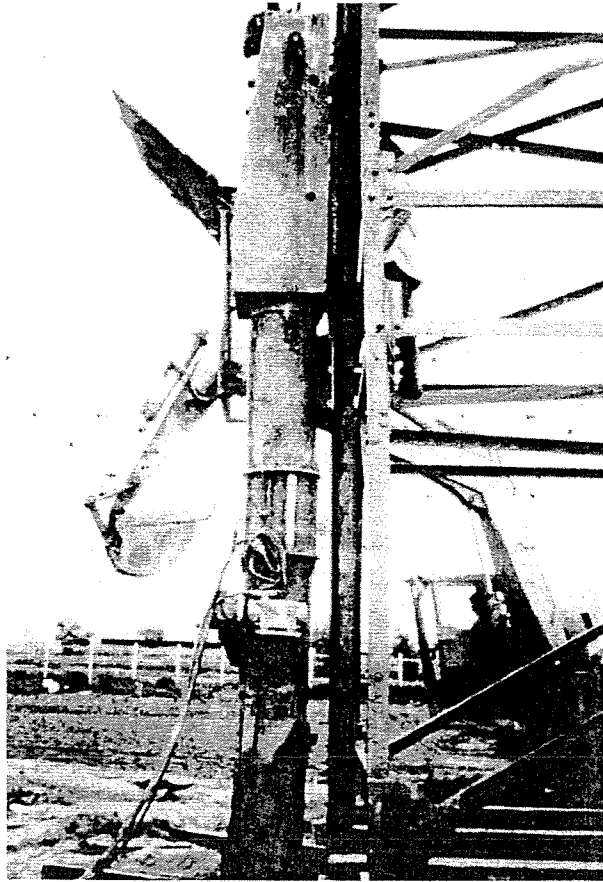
Construction of Sand Compaction Pile on Soft Bangkok Clay
